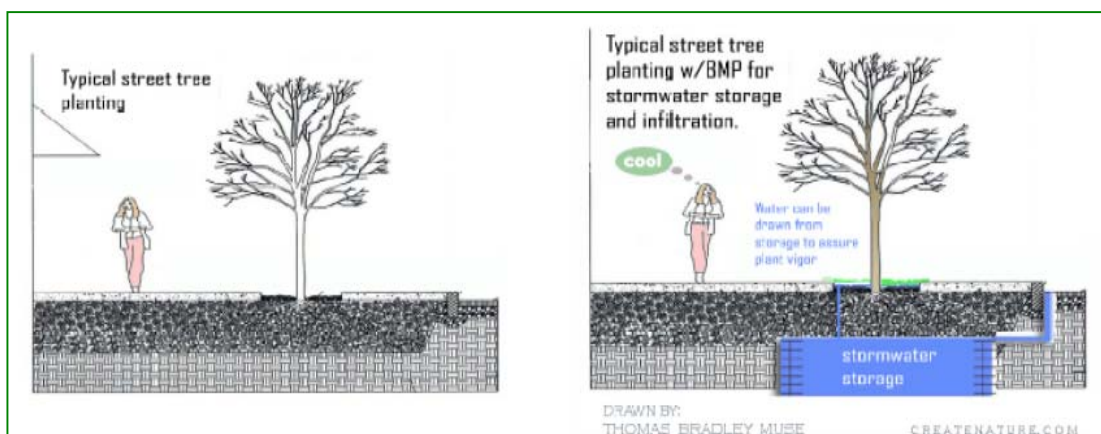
Comparison of typical street tree planting and street tree planting with BMP for stormwater storage and infiltration; Source: Gaia Institute
